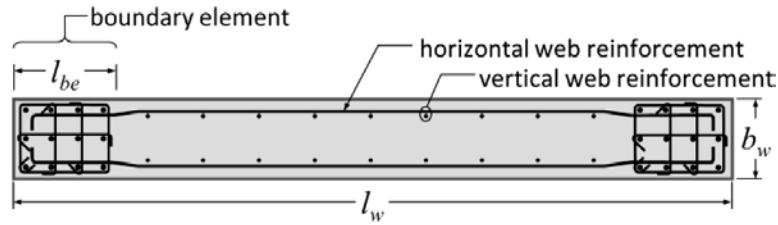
Typical reinforcement for cantilever wall with boundary elements (Moehle et al., 2012).
